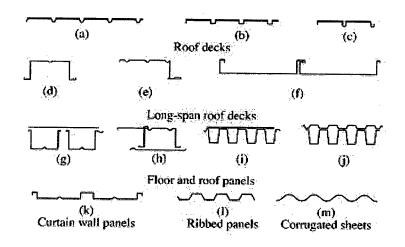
Decks, Panels, and Corrugated Sheets. (From Pham, Mills, and Zhuge, 2001"Experimental Capacity Assessment of Cold-Formed Boxed Stud and C Stud Wall Systems used in Australian Residential Construction.")
